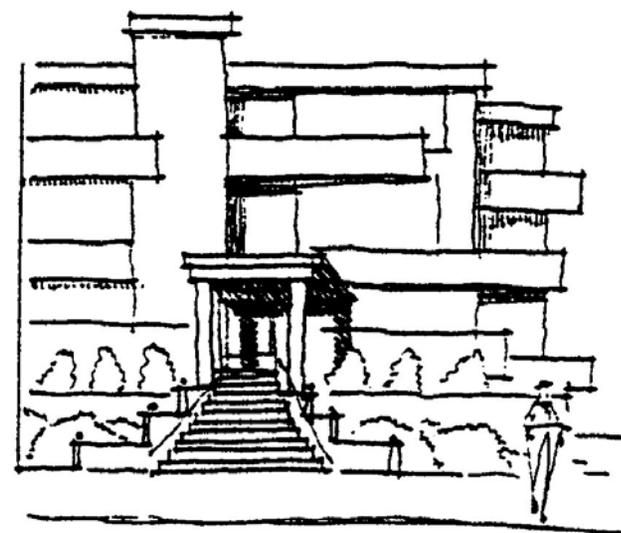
The covered and recessed entry to the building is well articulated, and with the landscaped planting beds and stairs provides an elegant transition between street and residence.
